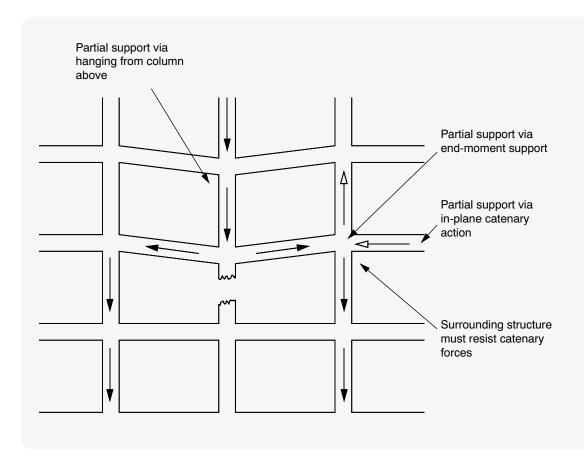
Alternate load paths available in a building designed with vertical and horizontal ties (Source: IStructE (2010)).
